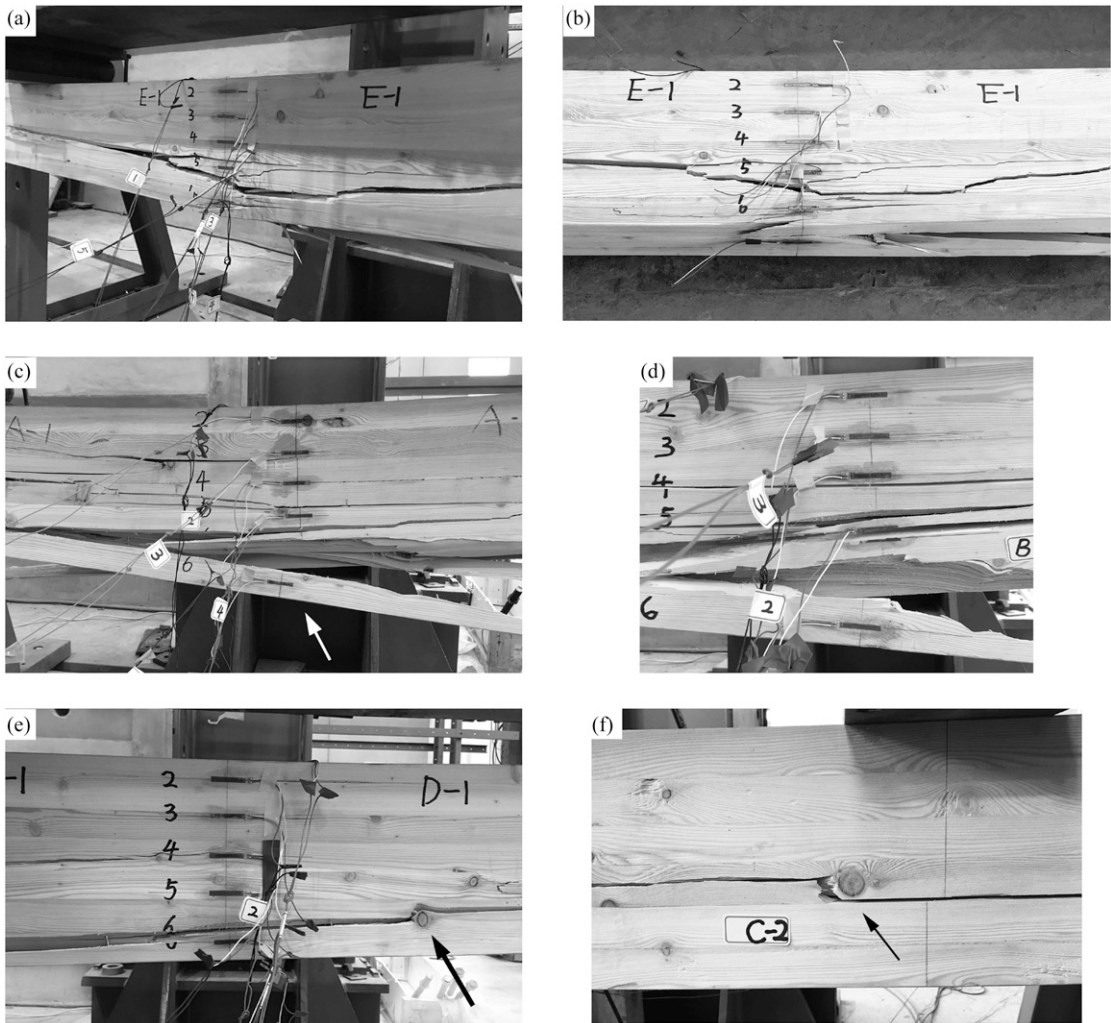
Failure photos of the specimens: (a, b) Typical failure mechanism of the hollow glulam beams, (c, d) Typical failure mechanism of the solid glulam beams and specimen JHL2-3, and (e, f) Knot crack failure mechanism.
